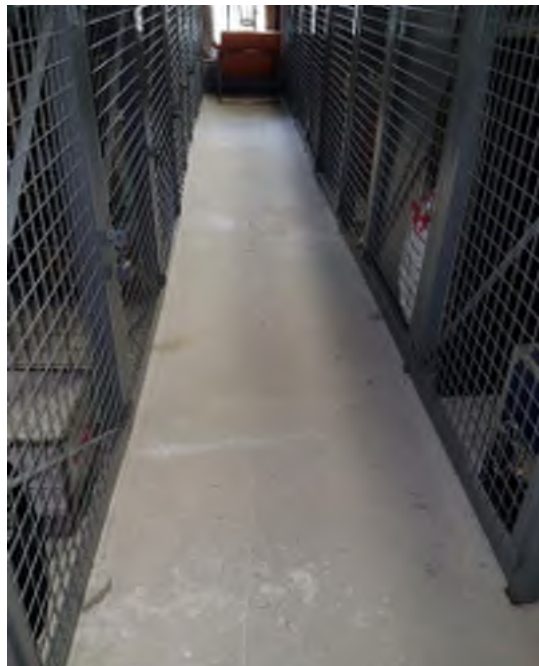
Hairline/surficial cracks observed within the boat house, facing southeast. Cracks did not breach to the subsurface. 27 February 2019.
